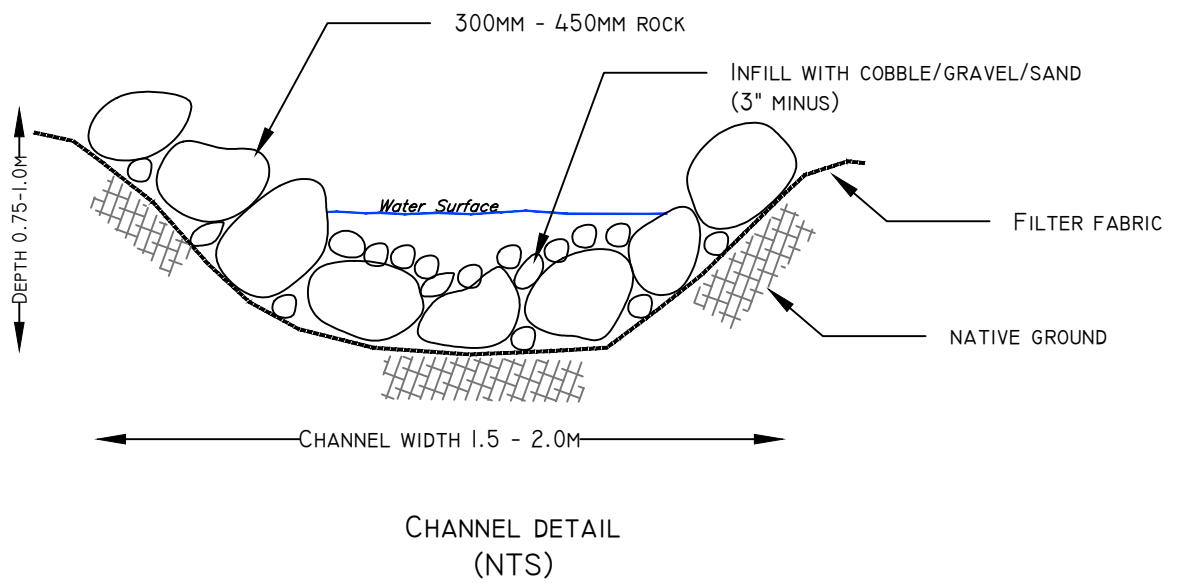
DAFFODIL DRIVE DEVELOPMENT- CHANNEL DETAIL & PLANTING PLAN
